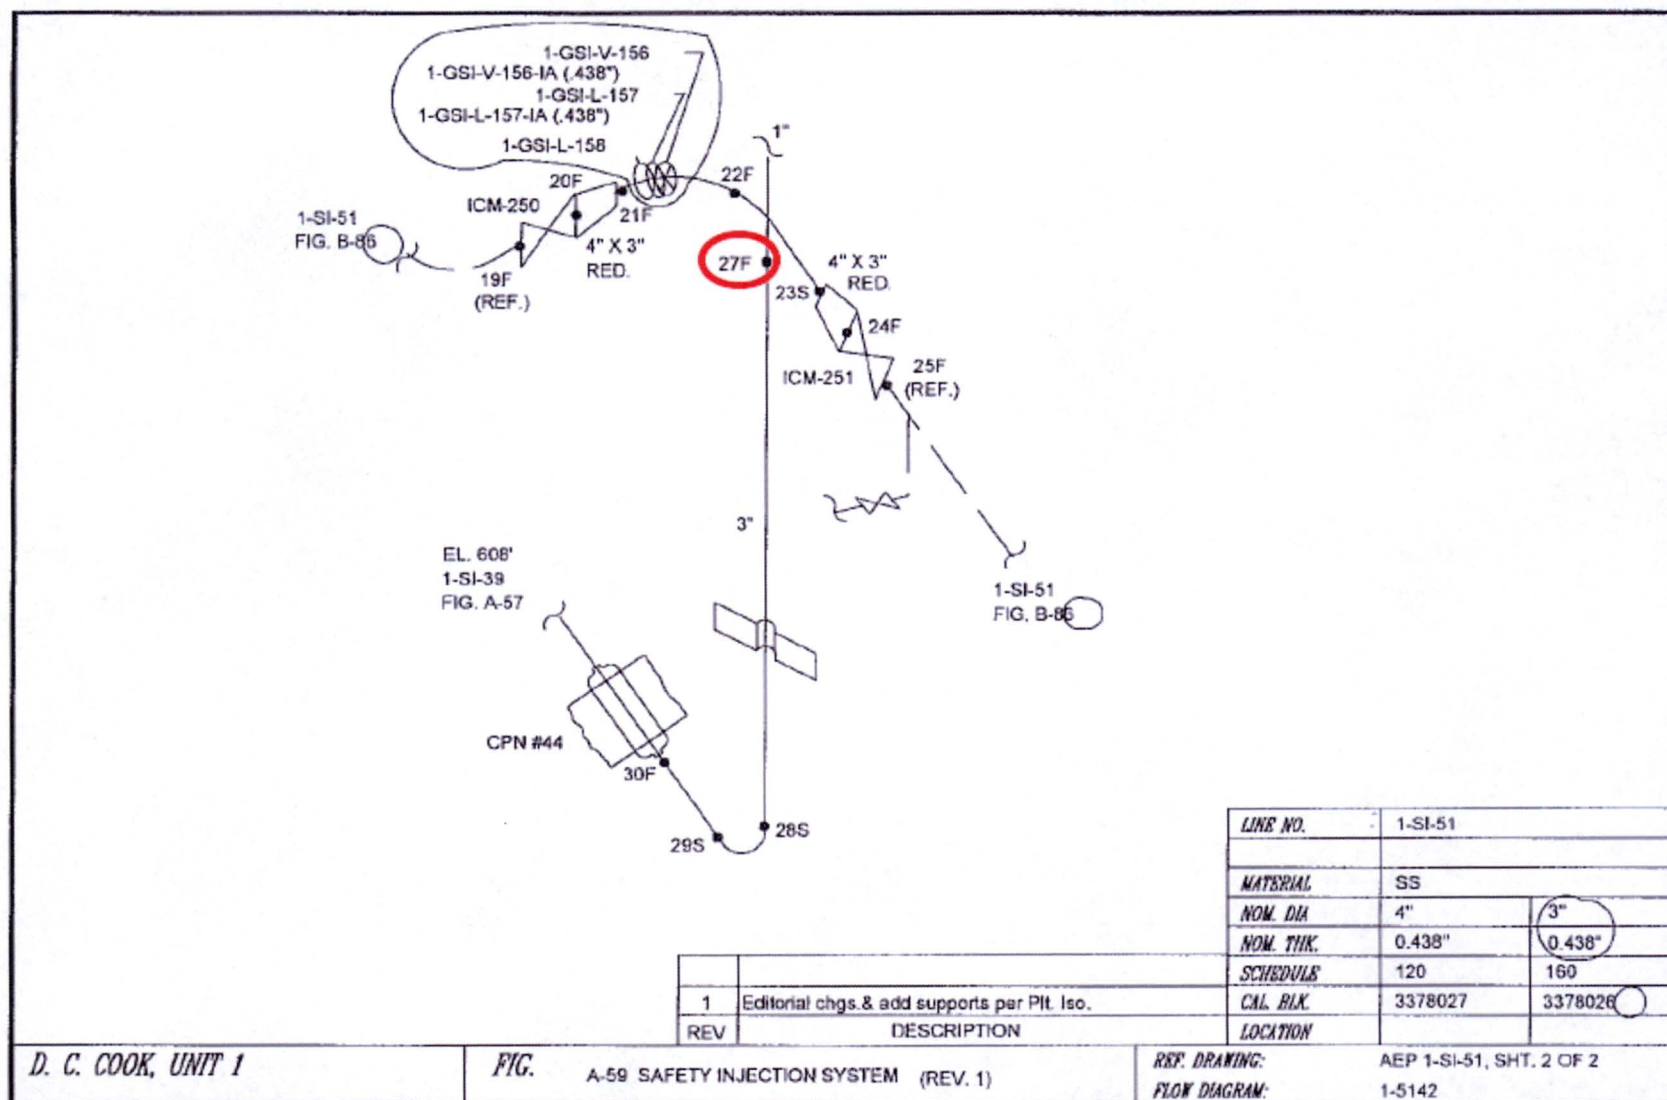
Weld 1-SI-51-27F (Extracted from Reference DRAWING A-59)
